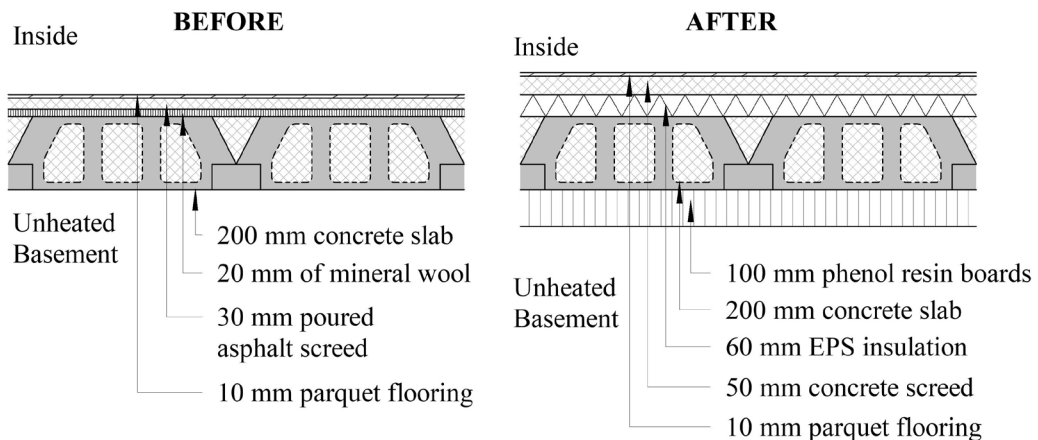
Cross-section view, ground floor slab towards basement, initial and retrofitted state.
